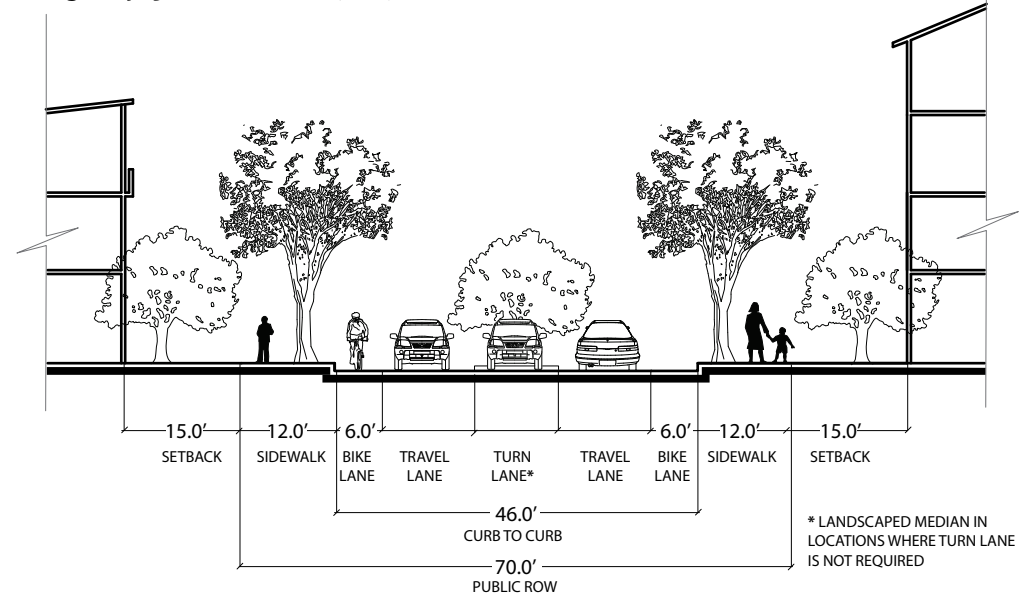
Viera Avenue (New) between PG&E East/West Easement and the Railroad
